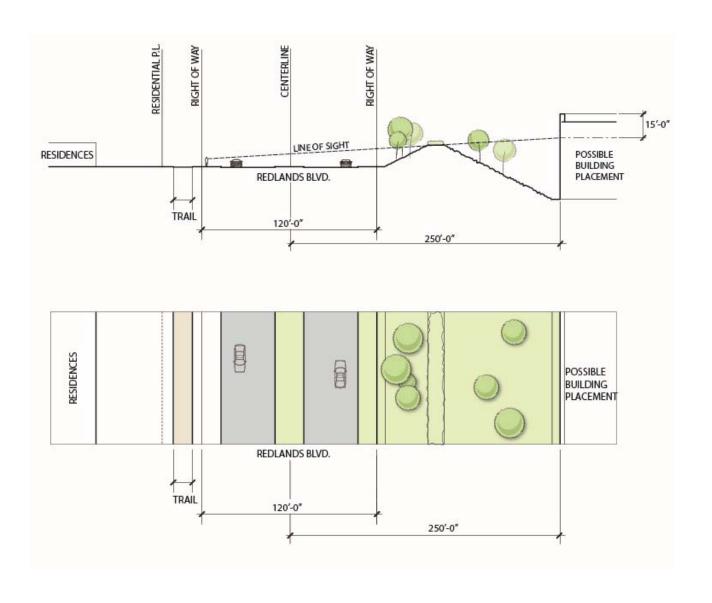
, 4-6 Redlands Blvd. Section B and Plan View B (pg.4-7)
